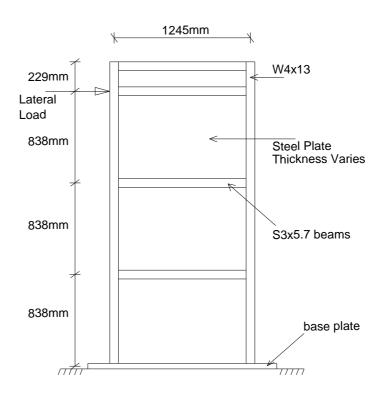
Details of Specimens Tested by Caccese et al. (1993)
